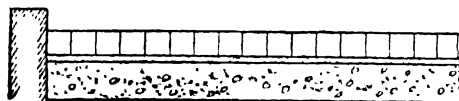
Granite Cube Paving on a Concrete Foundation.
